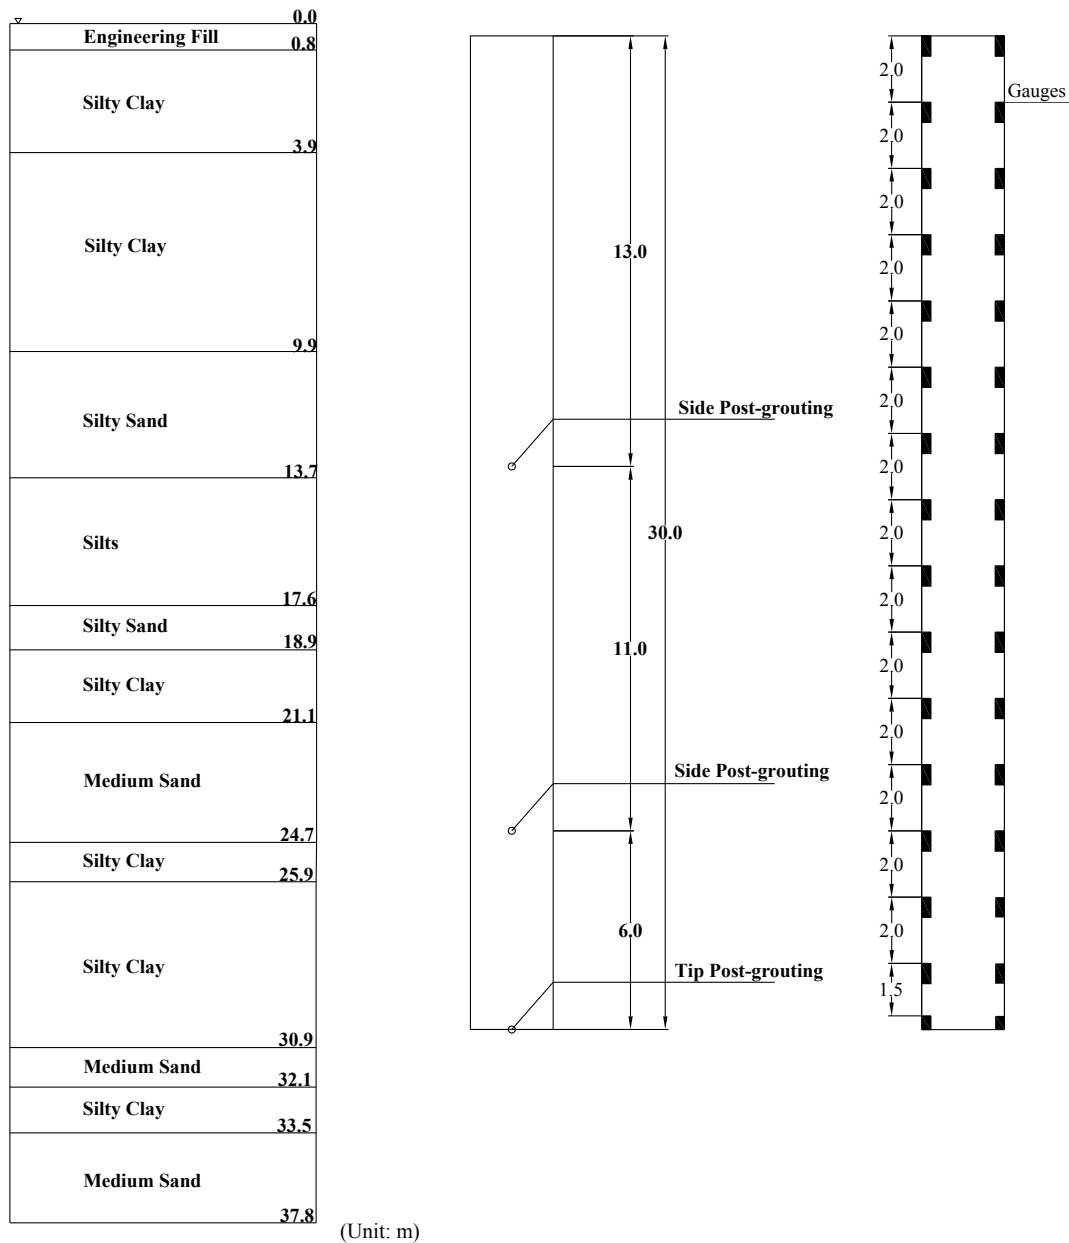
The soil profile at the site, post-grouting locations and gauges layout
